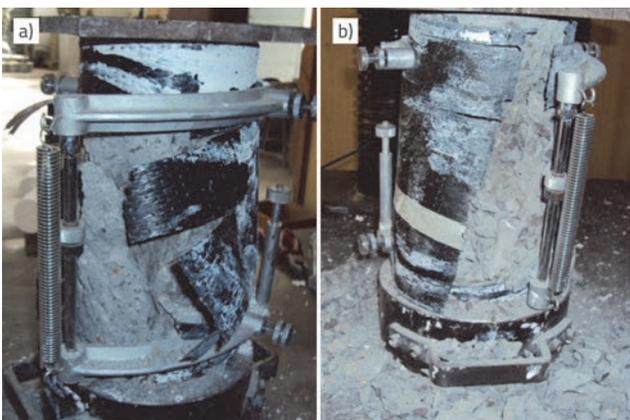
Typical failure of specimens: a) W-1-1; b) W-2-1
